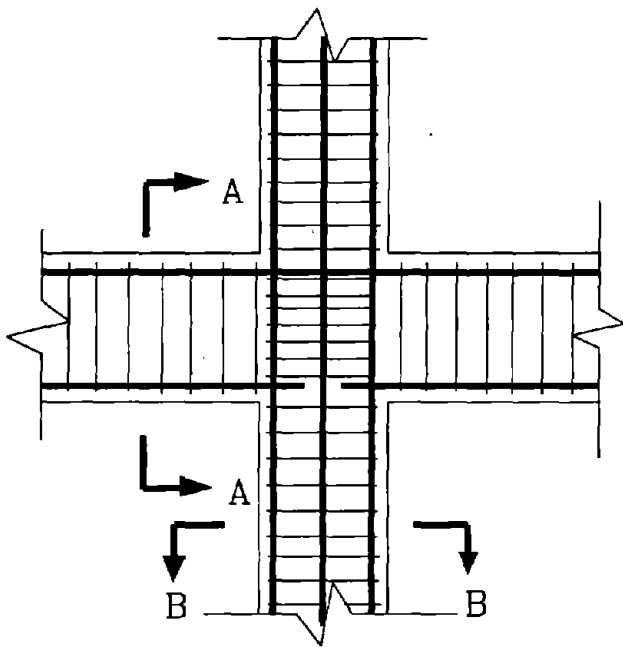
Beam-Column Joint Reinforcing Details (continued)
